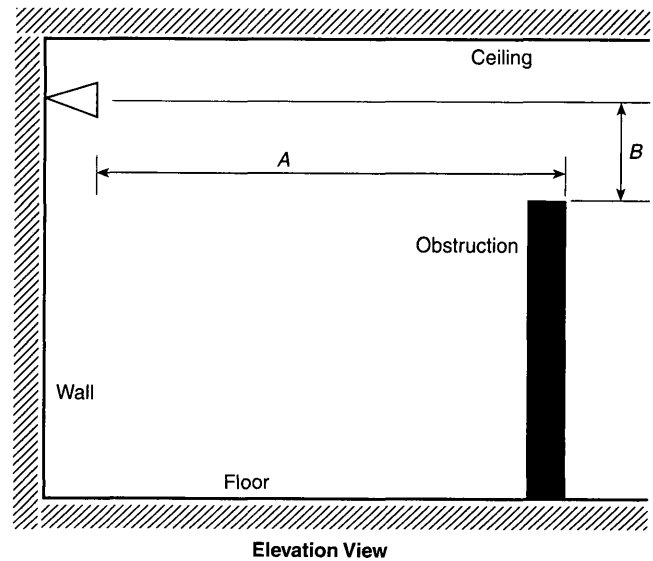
Minimum Distance from Obstruction (Standard Sidewall Spray Sprinkler)
